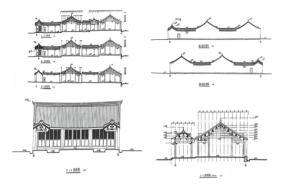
Section and elevation of Three mountain Kings Ancestral Temple in Jiexi Lintian.
